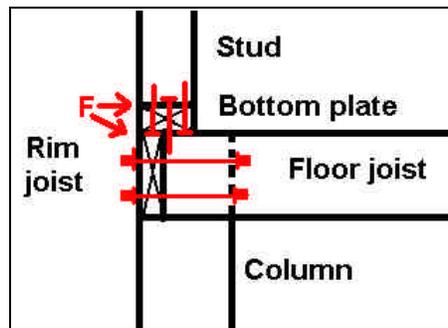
Typical cross section of home elevated on timber piles, concrete or masonry columns. Floors are usually bolted or strapped to the columns (in red). Common failure points are the nailed connections where the wall is attached to the floor.
